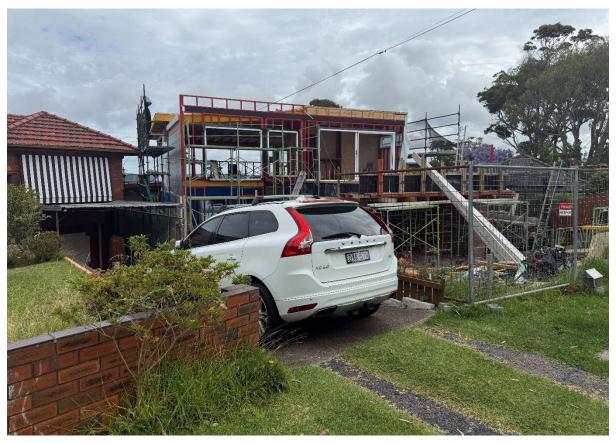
The existing dwelling (left) and the neighbouring dwelling under construction (right)
